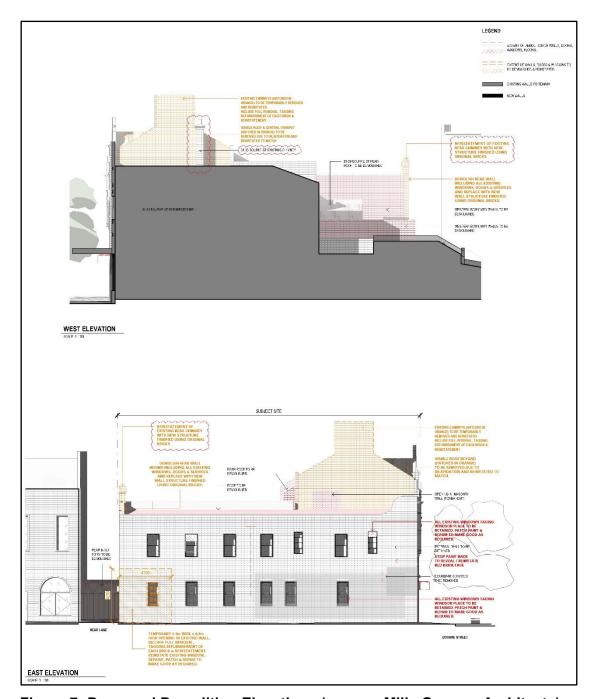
Proposed Demolition Elevations (source: Mills Gorman Architects)
